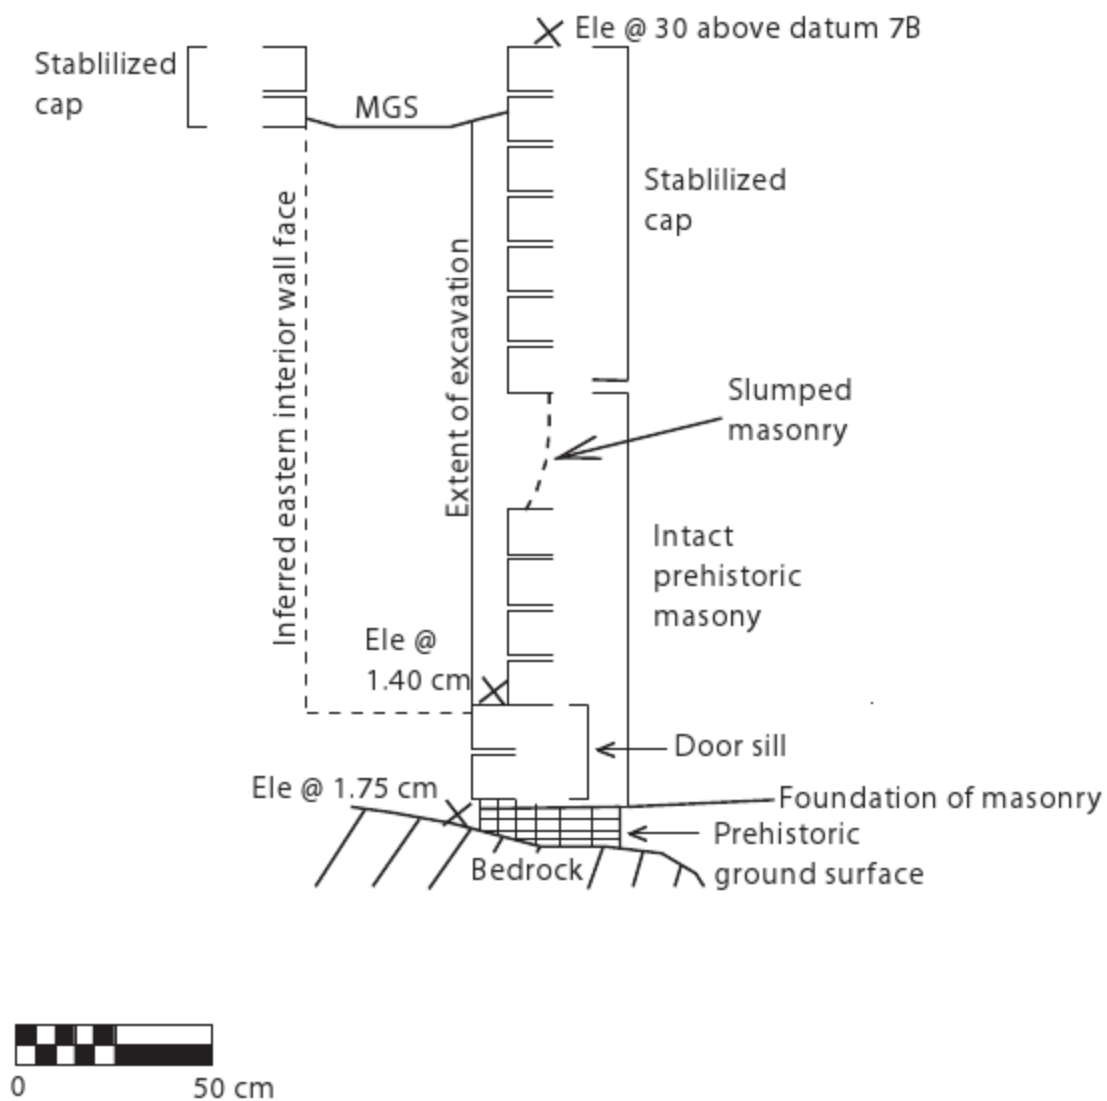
Room 7, Feature 3, doorway in south wall. Looking south.
